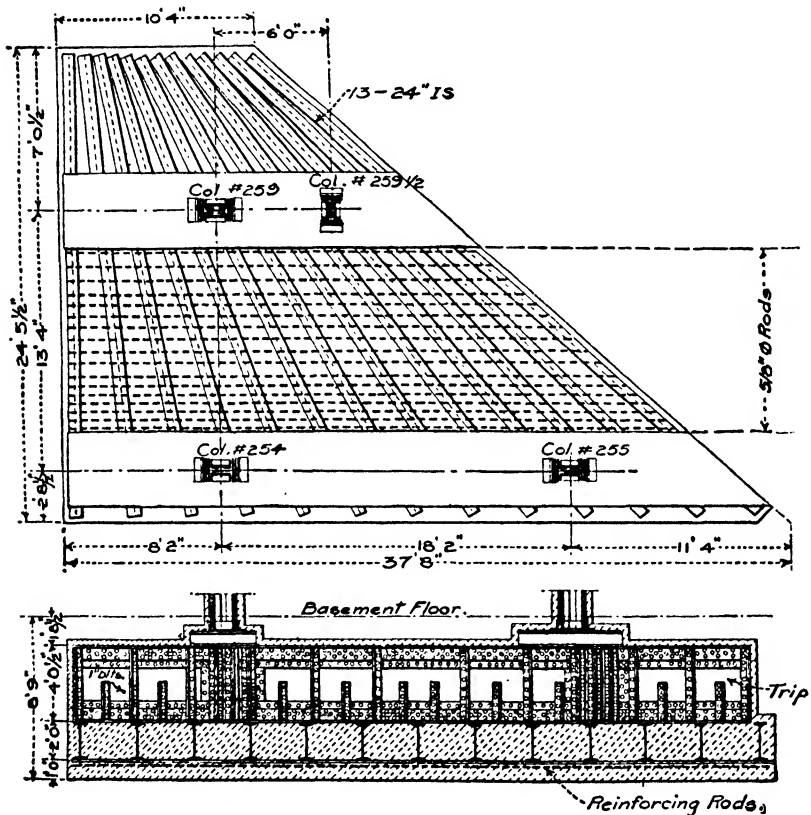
Special Footing for Four Columns, Curtis Building, Philadelphia.
